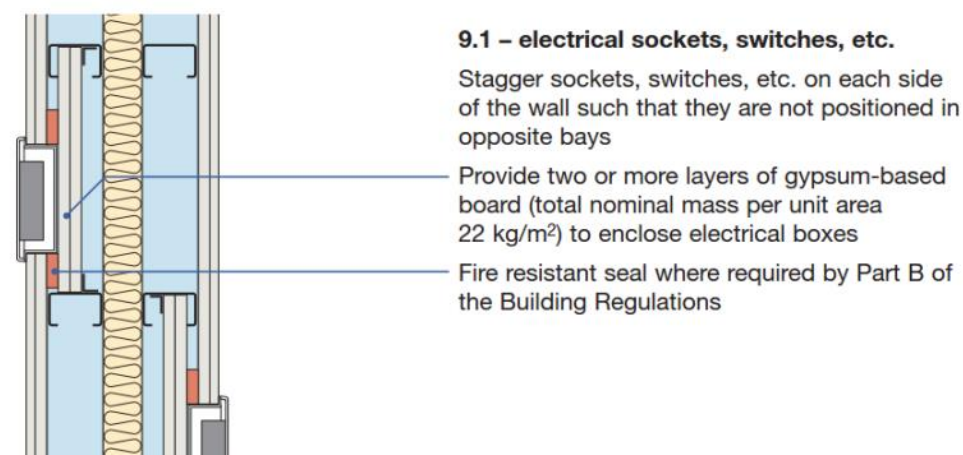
RSD Plan Plasterboard Backing Detailing
